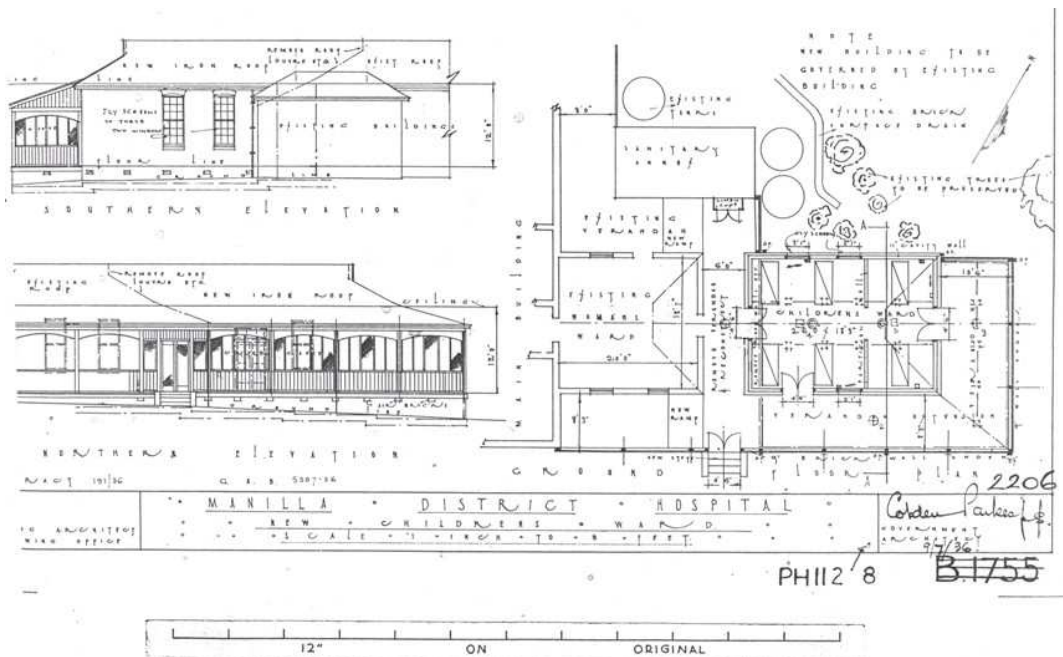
1936 Plan for the Children’s Ward signed by Parkes. (Source – OPWS Plan Room)
